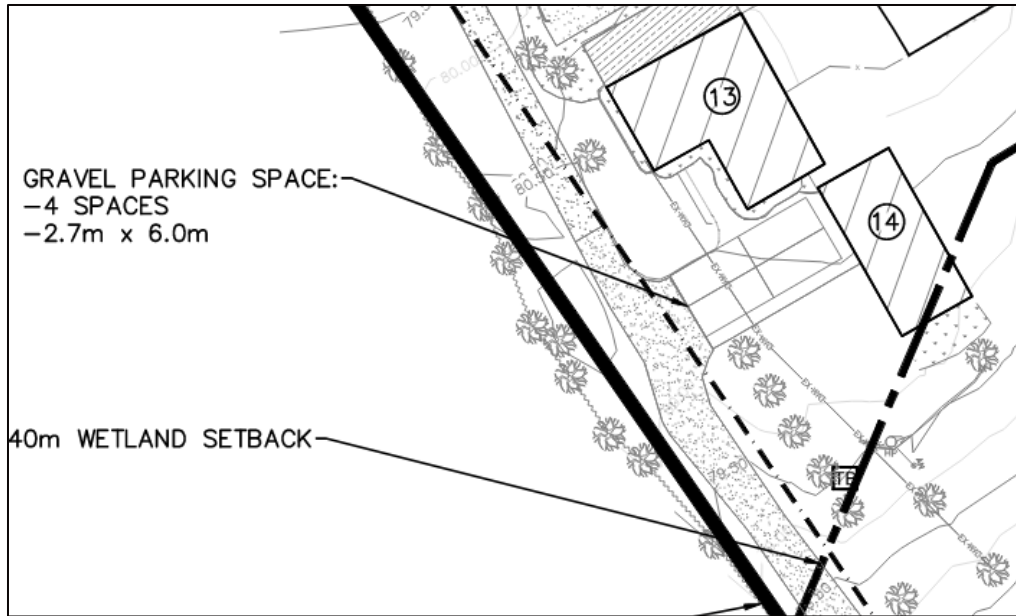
Cottage Parking Area Site Plan Existing – 2 (Geer Galloway)
